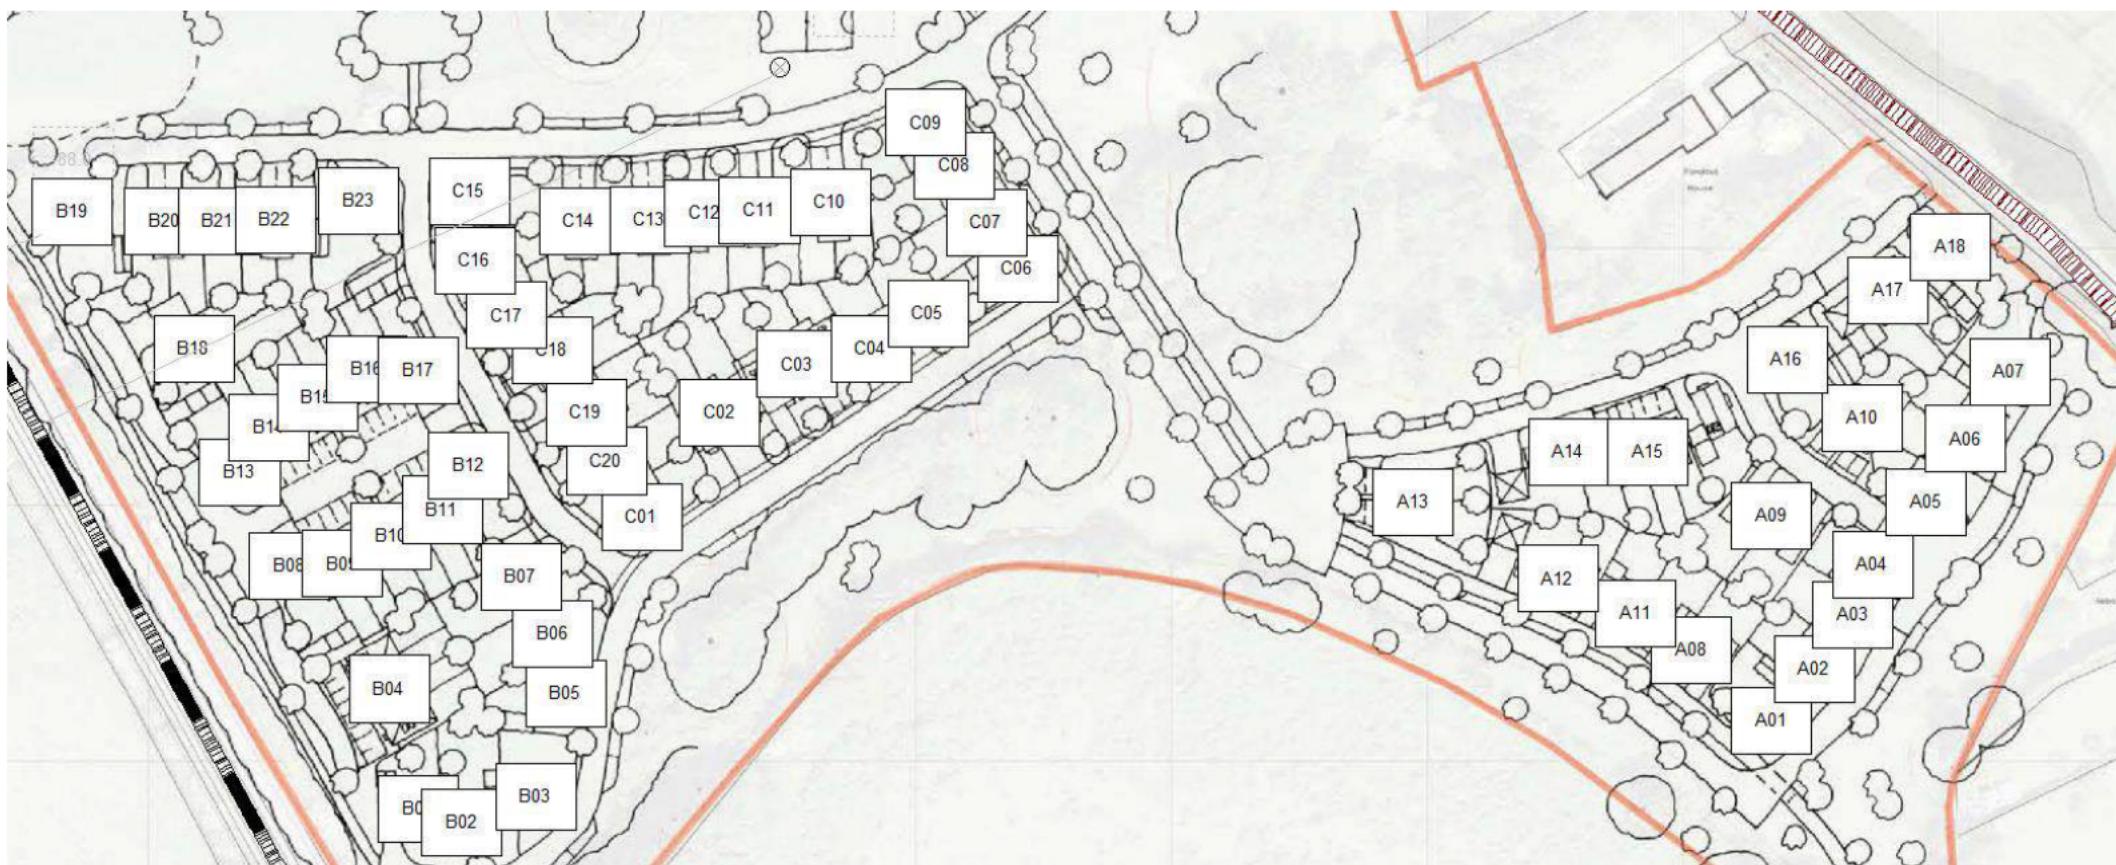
PLAN OF PROPOSED DEVELOPMENT AT PONDTAIL FARM – ASSESSMENT AREAS A, B & C
